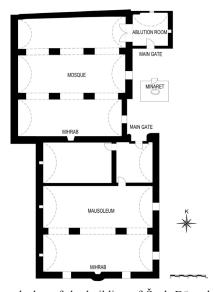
General plan of the building of Šayḫ Dāwud (R. Doğru, 2024)
